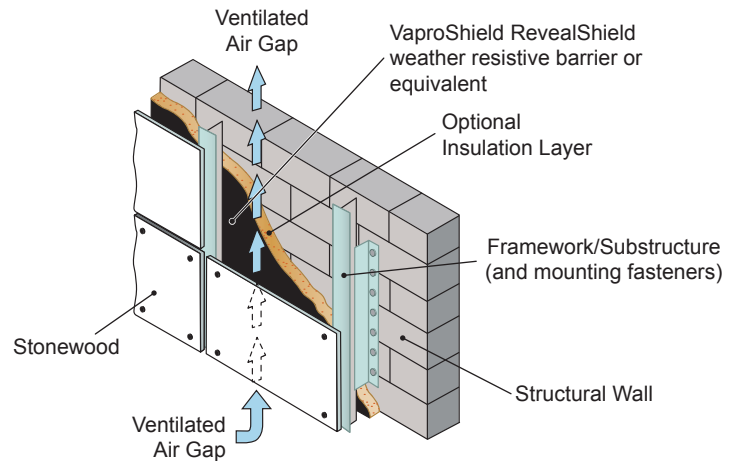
Stonewood used as rain screen cladding in ventilated facade system
